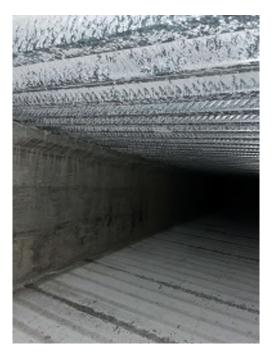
Deck core hole D29, view inside box girders, girder web and top flange, note dampness and staining
